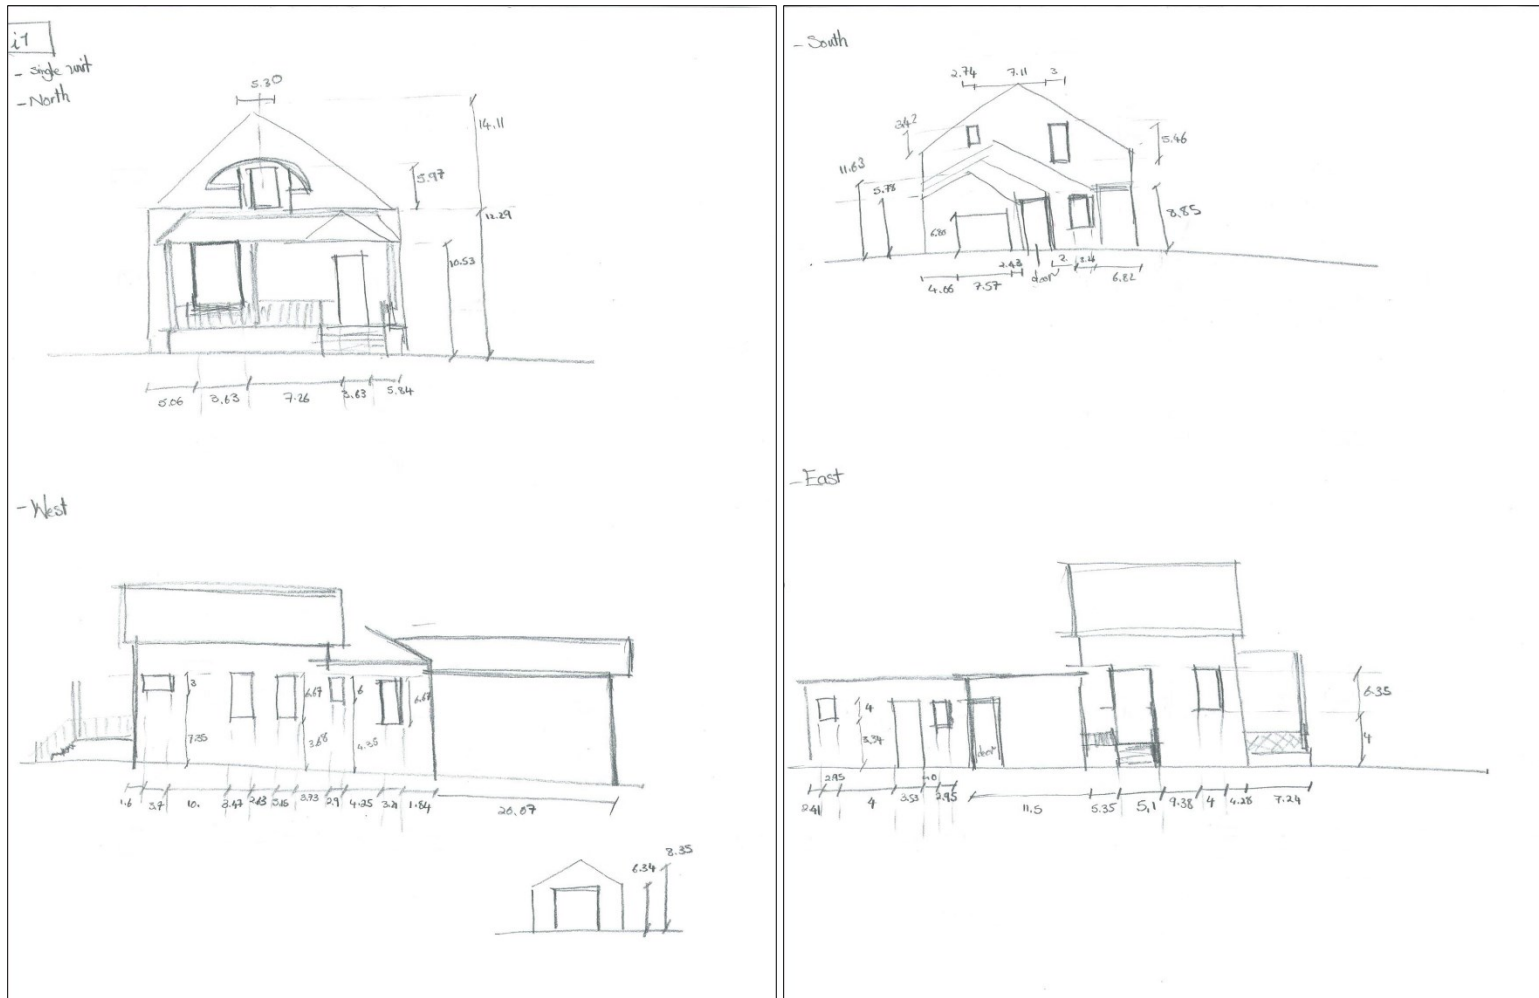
Example of sketches made of north, south, east and west building facades (Source: Author).
